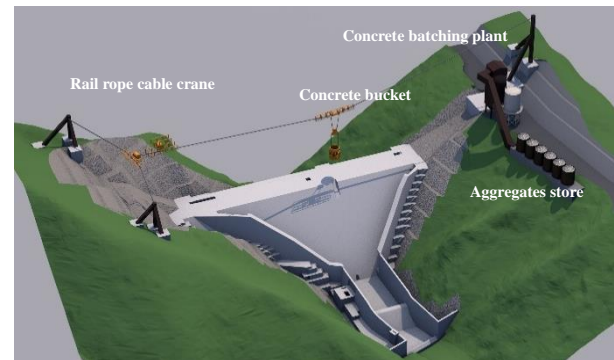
Dam body and layout of concrete production, conveyance, and placement plant
